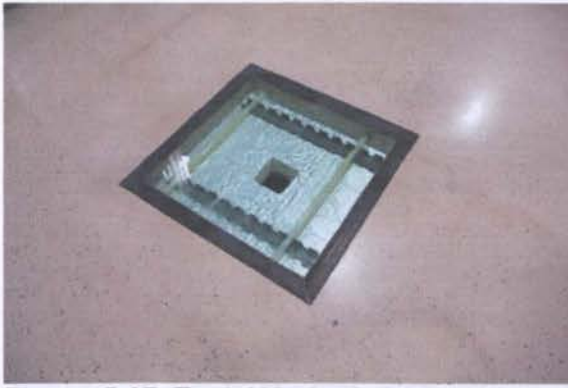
'Truth Window' showing underfloor system heating pipes Source: Author
